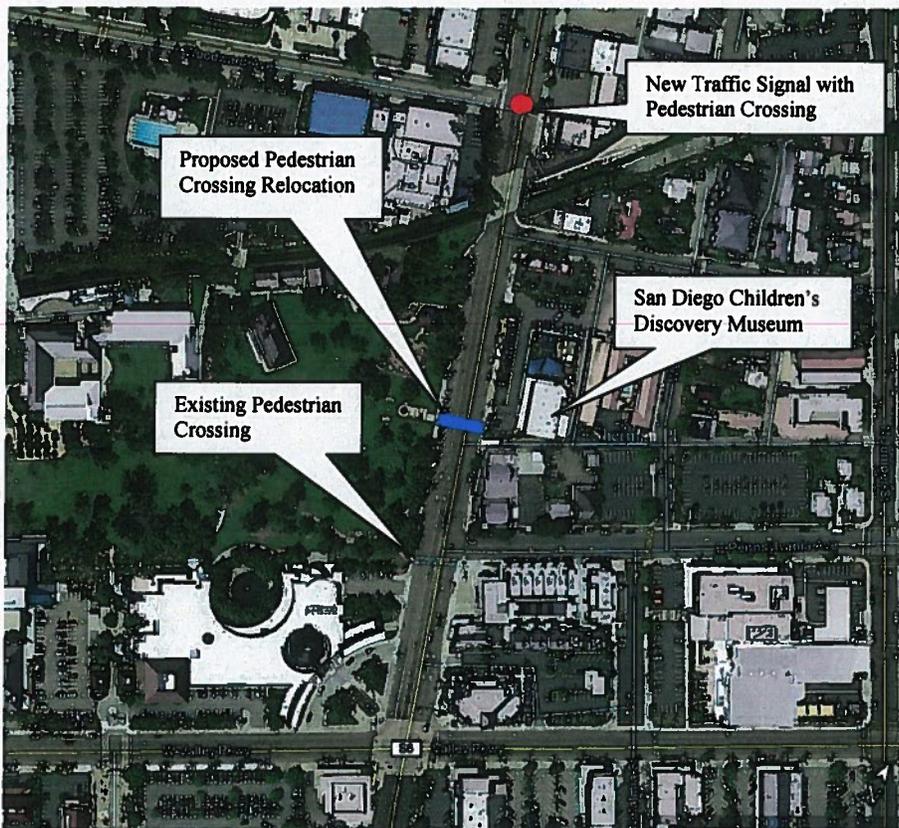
Proposed Relocation of Crosswalk on N. Broadway
